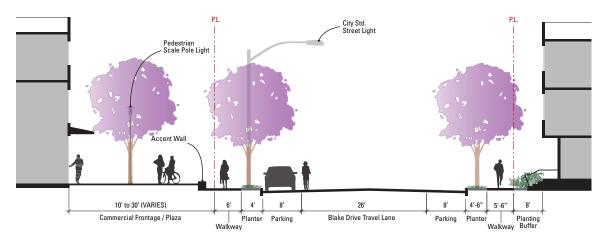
Section L. Blake Drive Section at Parcel A Plaza
